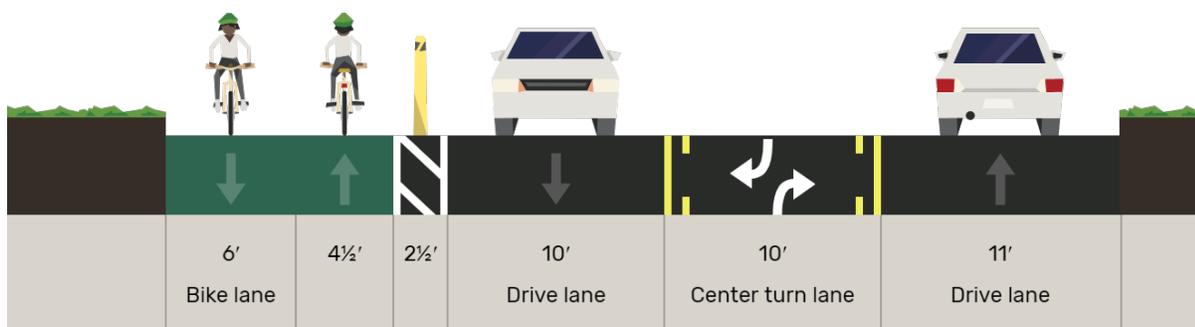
Giant Road – Alternative 2 General Cross Section (Facing North)
